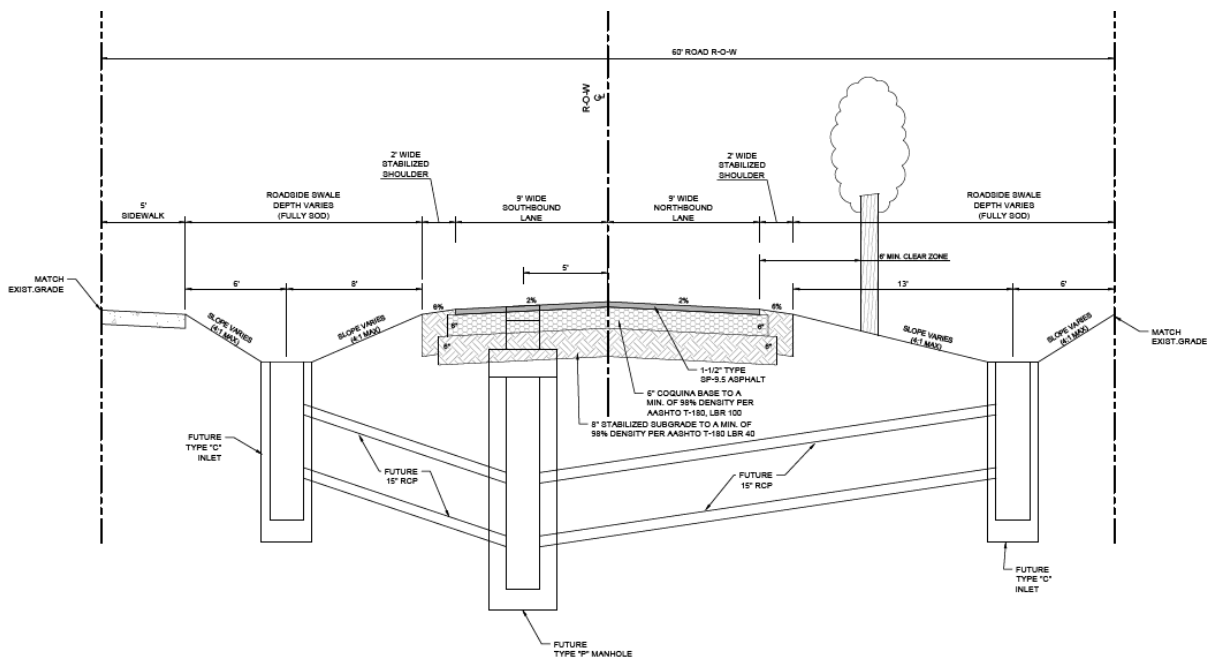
presents the typical section that will be utilized south of CR512 and east of Broadway within the 60' road rights-of-way. The design utilizes roadside swales as the means to direct such flows to the nearest sub-lateral ditch. The swales, in addition to the alleyway swales presented in Figure 6, provide positive drainage for all residential historic lots of record in this portion of the study area and provide important stormwater storage during flood events.
